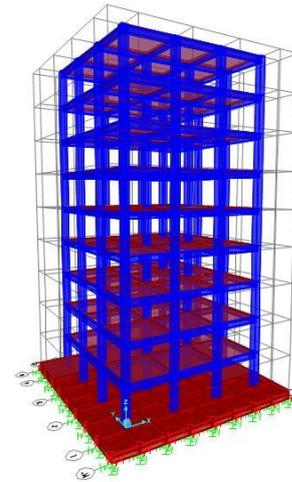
FEM model of Five Storey Building with Spring Support Condition
